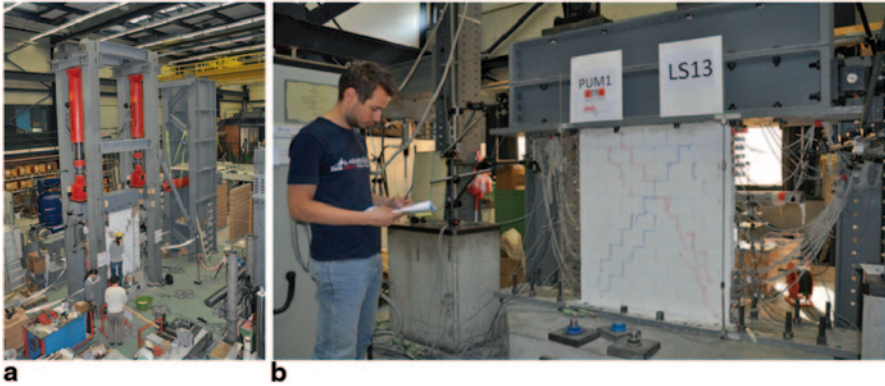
Test setups for quasi-static cyclic tests on URM piers at scale 1:1 (a) and at scale 1:2 (b) (Petry and Beyer 2014a)
